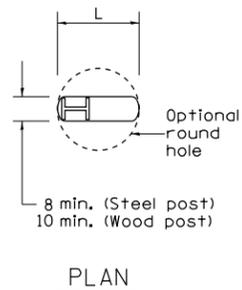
Plate A shall be placed between rail element and block-out at non-splice mounting points only when steel block-outs are used.
